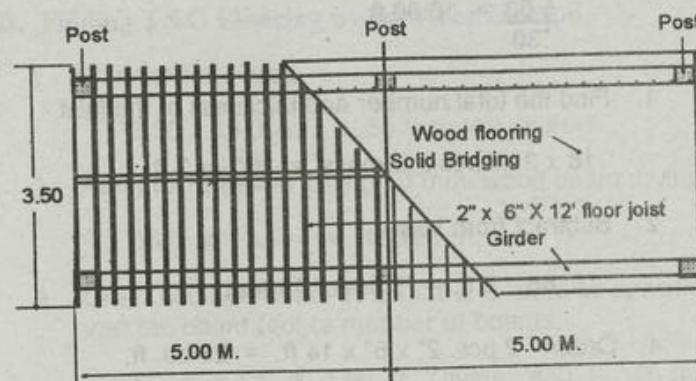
FLOOR JOIST AND WOOD FLOORING
